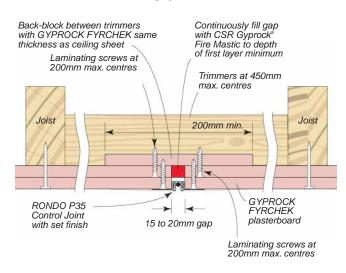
CONTROL JOINT PERPENDICULAR TO TIMBER FRAMING – 2 LAYERS
